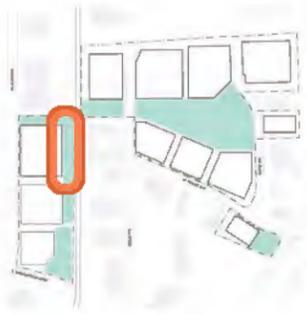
Ellis Walk at Residential 2 section, view looking north
